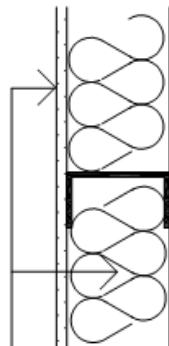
Construction to achieve  $R_w + C_{tr}$  40, for pipes running adjoining habitable spaces (Bedroom, Living)
